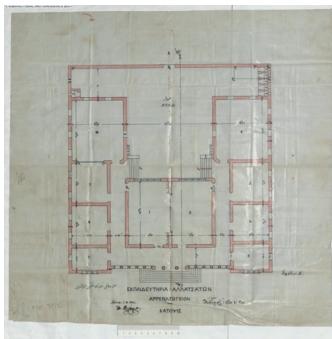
Ground Floor Plan of the Greek Boys' School in Alaçatı Note. From BOA, 78.21.6, H. 12.04.1326.
